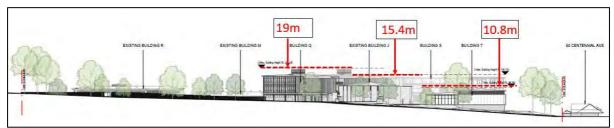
| Proposed Centennial Avenue (north) elevation (Base source: RtS, 2020)
